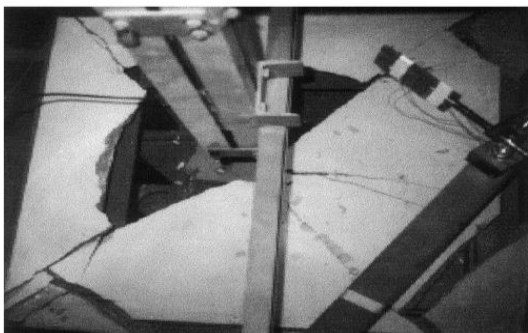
Failure of Plain Concrete Slab (Ong & Paramasivam, 1999)
